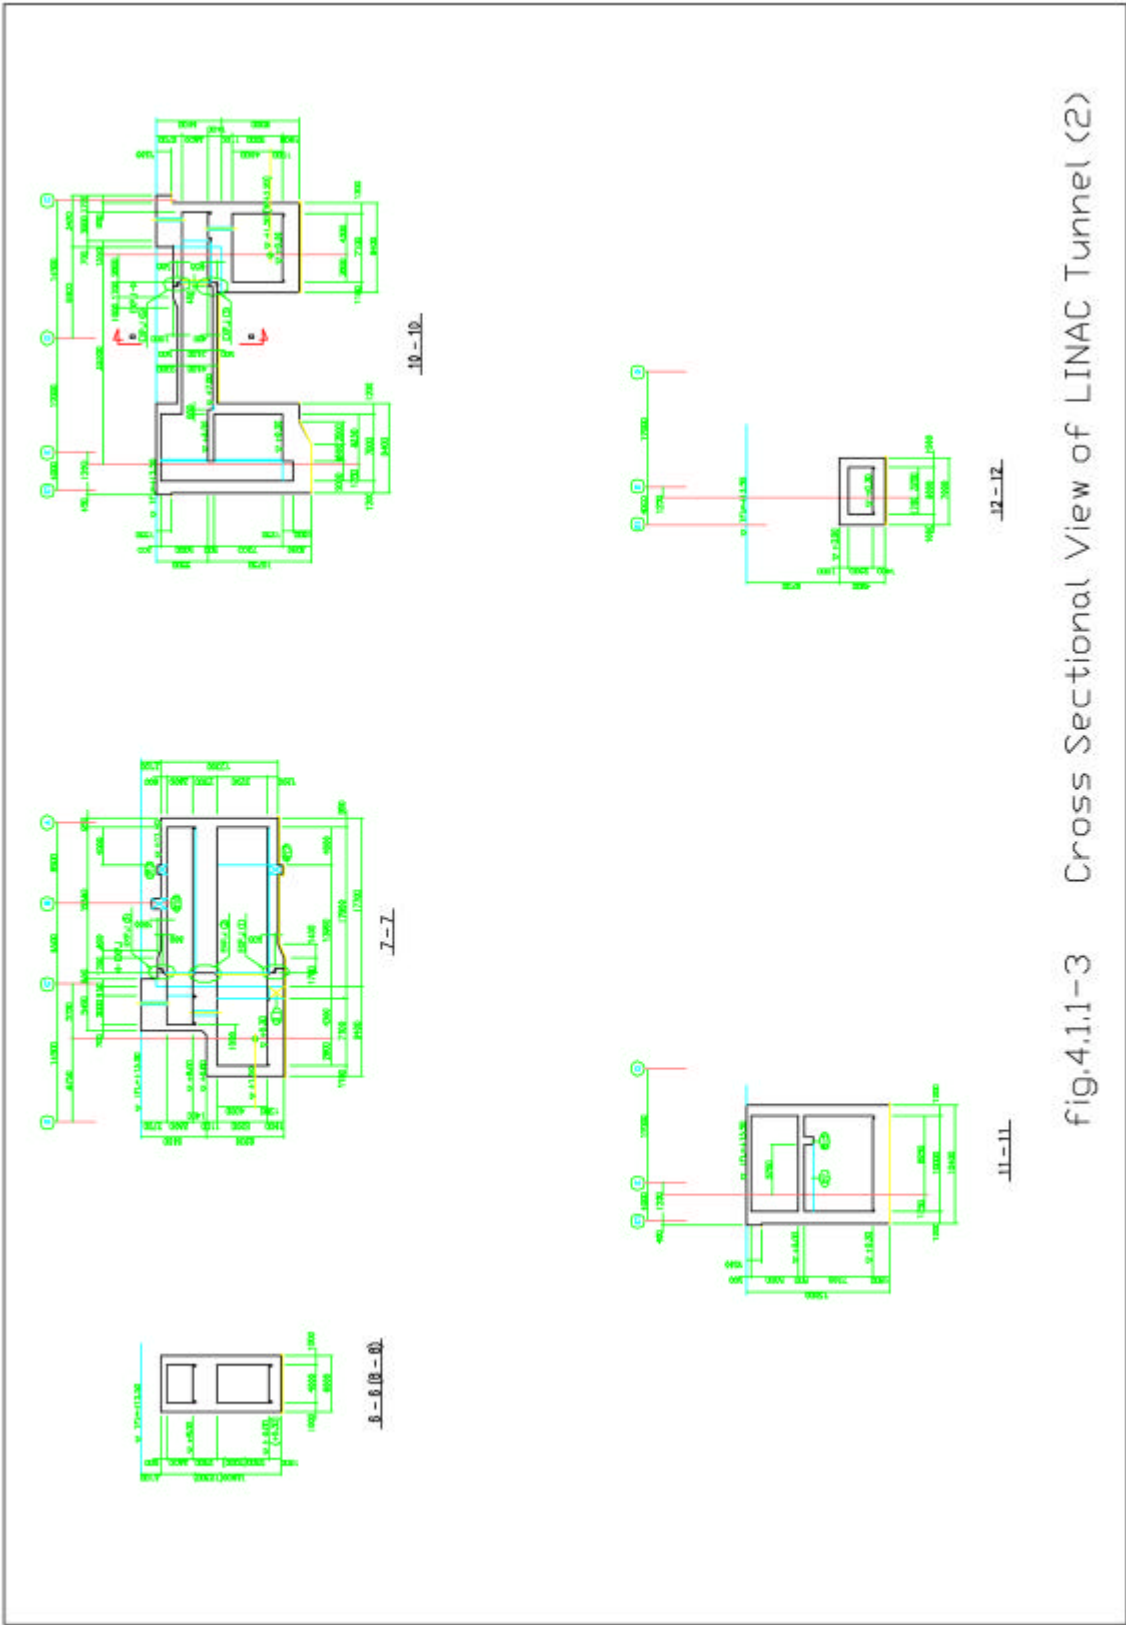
Cross Sectional View of LINAC Tunnel (2)
